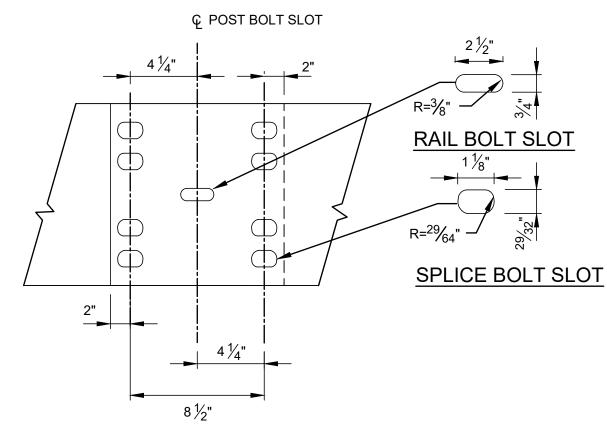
DETAIL OF RAIL SPLICE JOINT NOT TO SCALE
